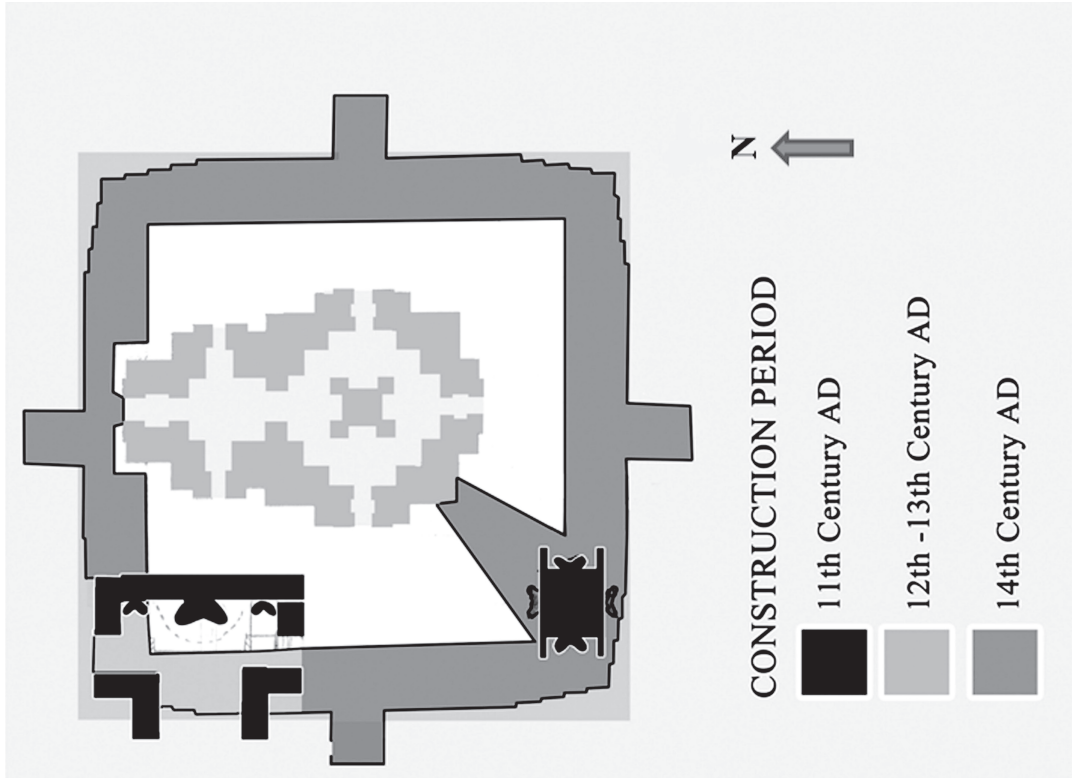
Plan of central structures (Drawing: Cho Zaw Min).
